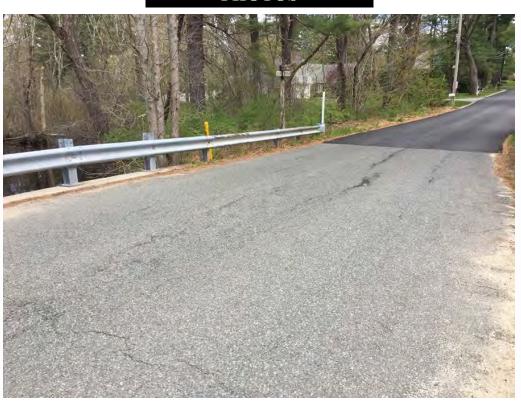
Longitudinal and transverse cracks, mostly on westbound travel lane and a pothole at the east end. At the west end, there is a full width transverse cracking.
